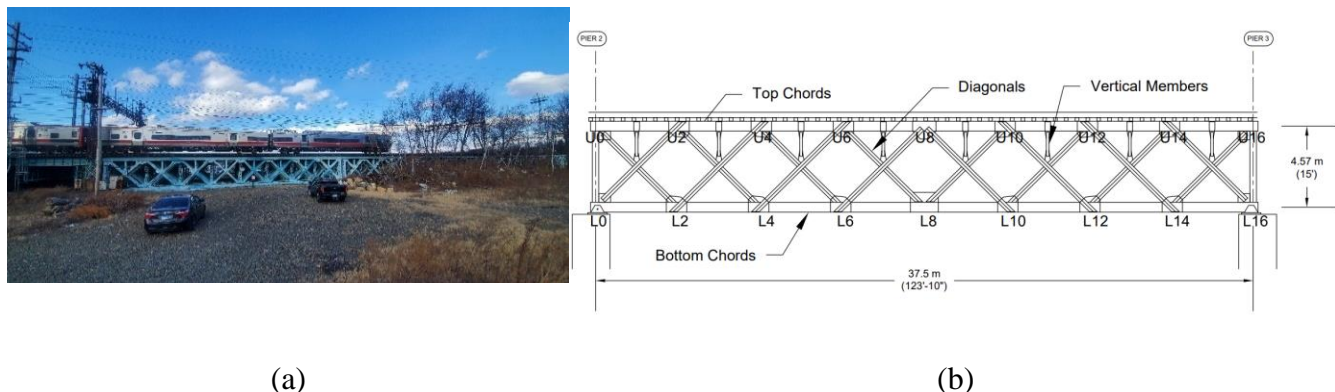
Span 3 of Cos Cob Bridge: (a) Picture, (b) elevation view drawing [14]
